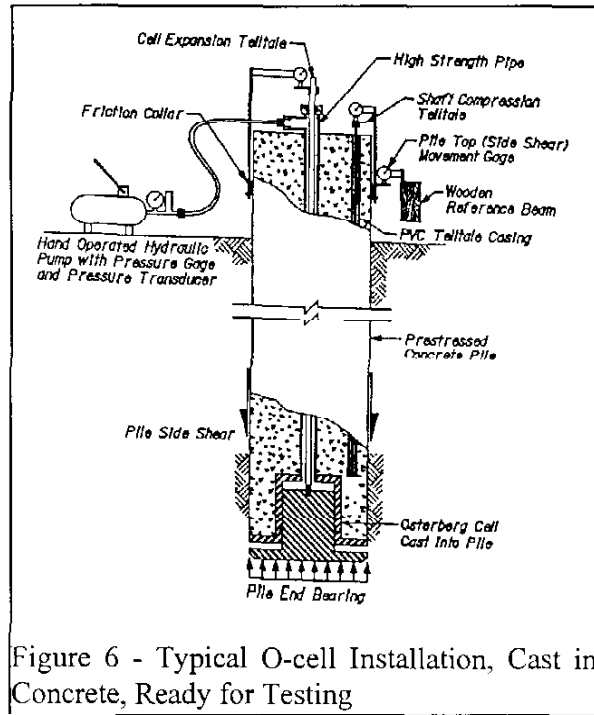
Typical O-cell Installation, Cast in Concrete, Ready for Testing
